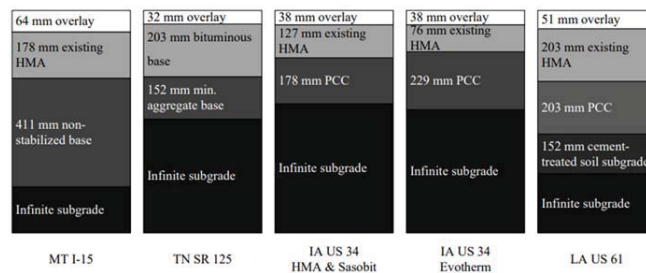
Pavement structure diagram of each project. (From top to bottom in turn are overlay, existing HMA, base, and subgrade respectively).
